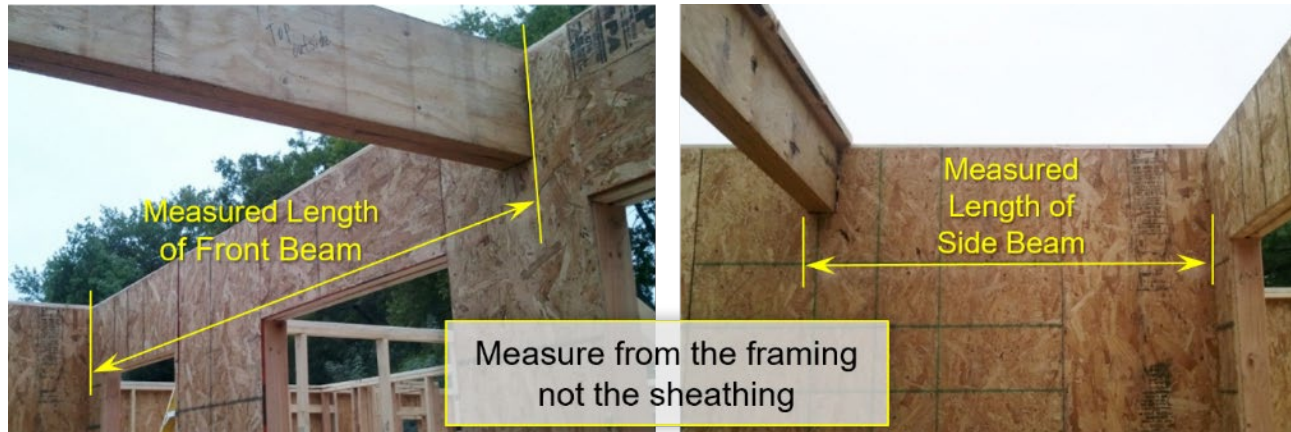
Measuring for Porch Beams (One Side Beam)
